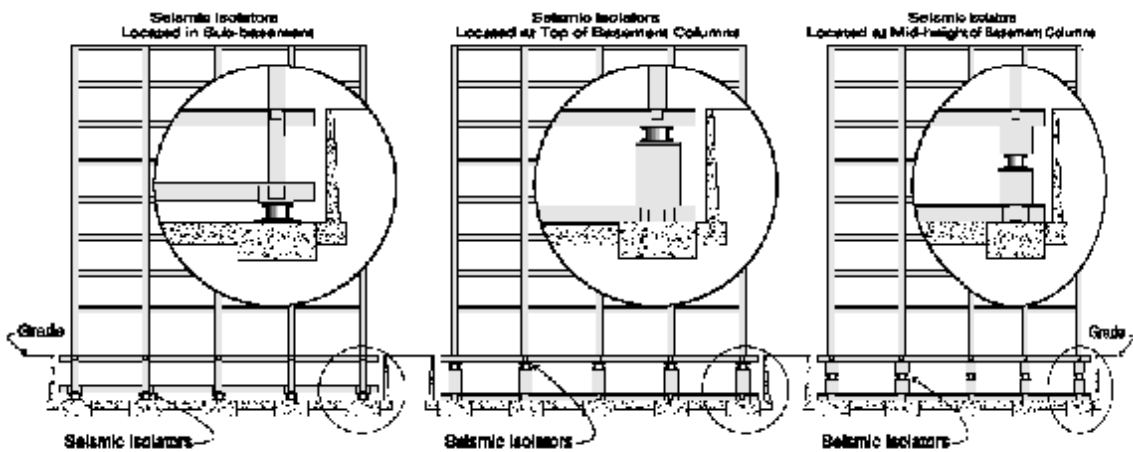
Isolator placement on foundation footing, basement columns and column mid-height.
